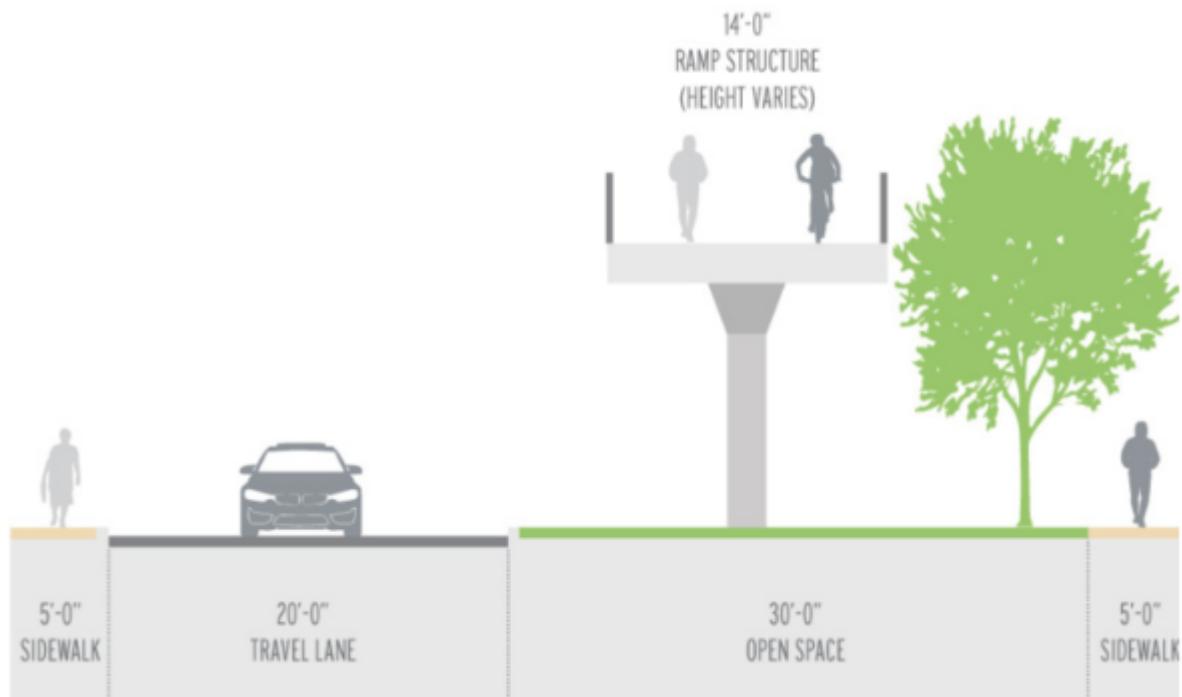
Hawthorne Avenue Concept 1A: Cross Section A
